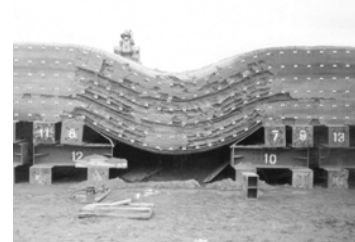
Deflection of the bridge (span: about 3 330 mm)
